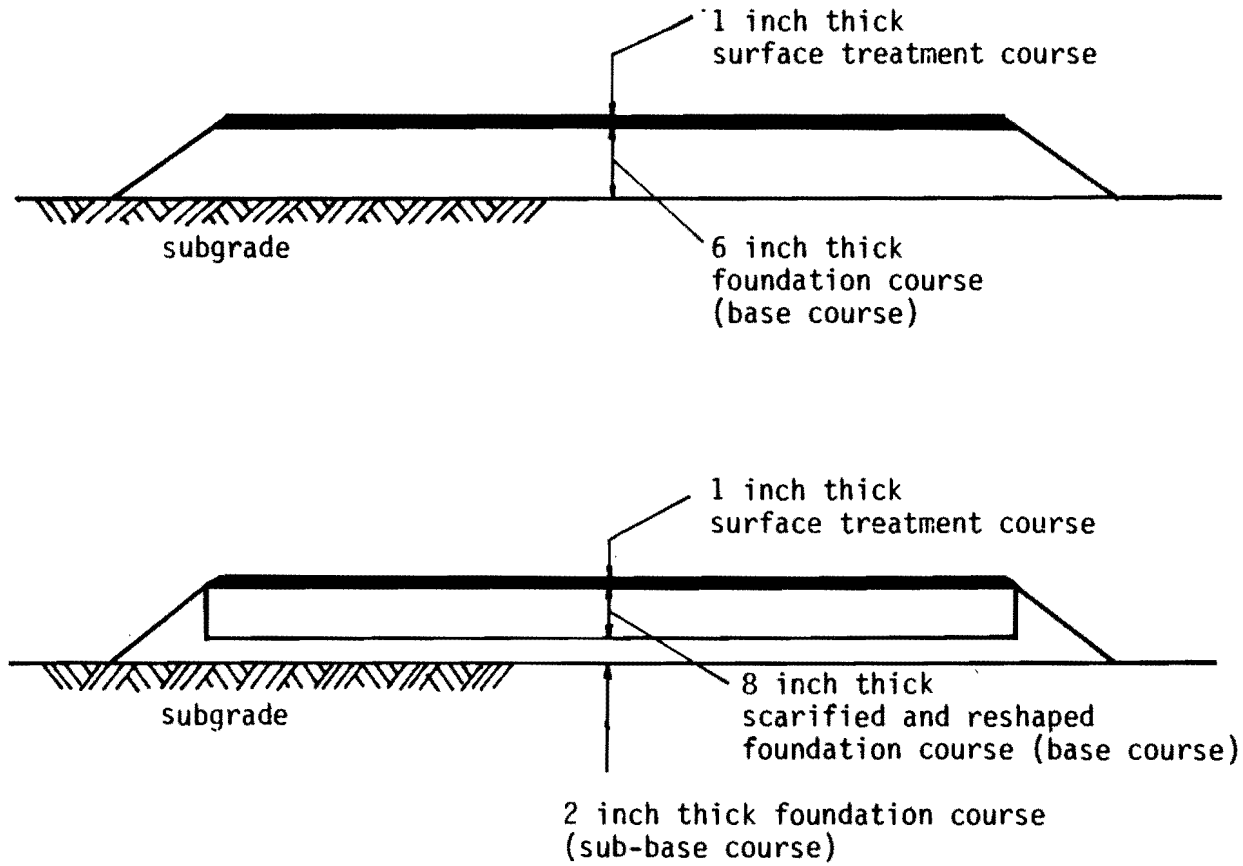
Typical Cross-Section of Farm-to-Market Roads
